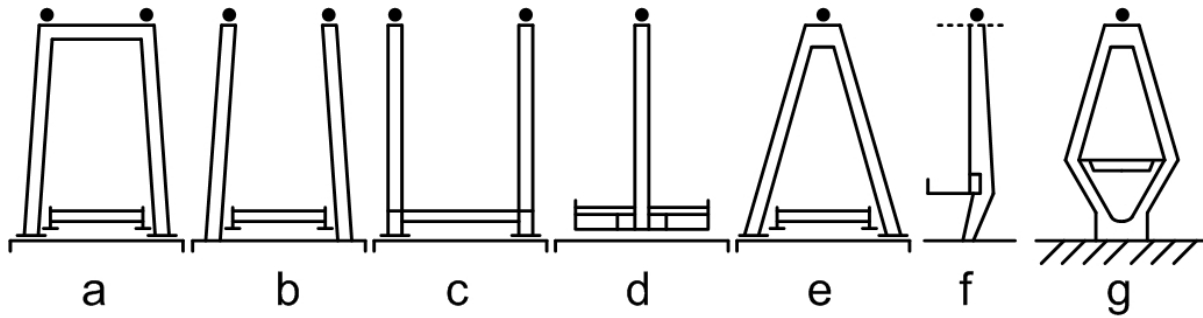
Shapes of Towers Used for Cable-Stay Bridges
